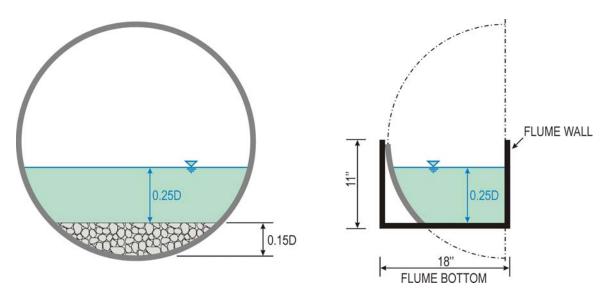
Bed Elevation at 0.15 culvert diameter and symmetrical half of Flume Culvert Model
